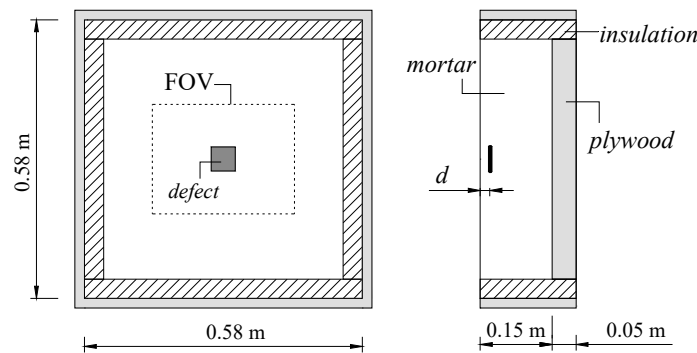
Schematic front view and cross section of one of the test specimens.
